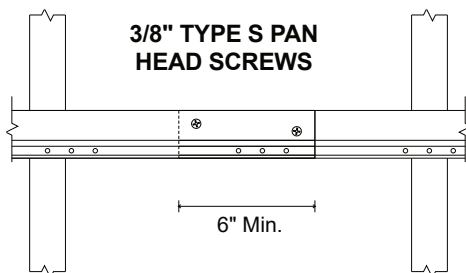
C SPLICE CHANNELS BETWEEN JOISTS
